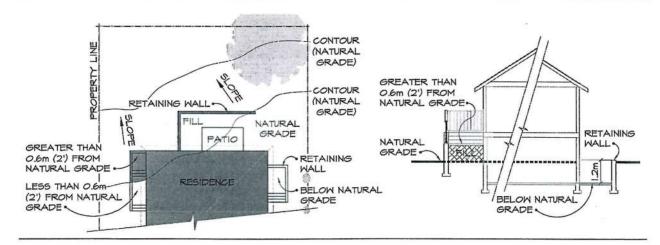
details how the proposed new ZRB amendments would apply to stairs. Where a retaining wall (1.22 m [4 ft] high or less) is constructed to facilitate on-site excavation, then minimum setback requirements and site coverage maximums would not apply. In contrast, where a wall is used to build landings or stairs higher than 0.6 m (2 ft), for example to gain access to an upper level, then both setback and site coverage requirements apply. Any walkways at or below natural grade and stairs that are less than 0.6 m (2 ft) high are not subject to minimum setback requirements and are not included in site coverage.
